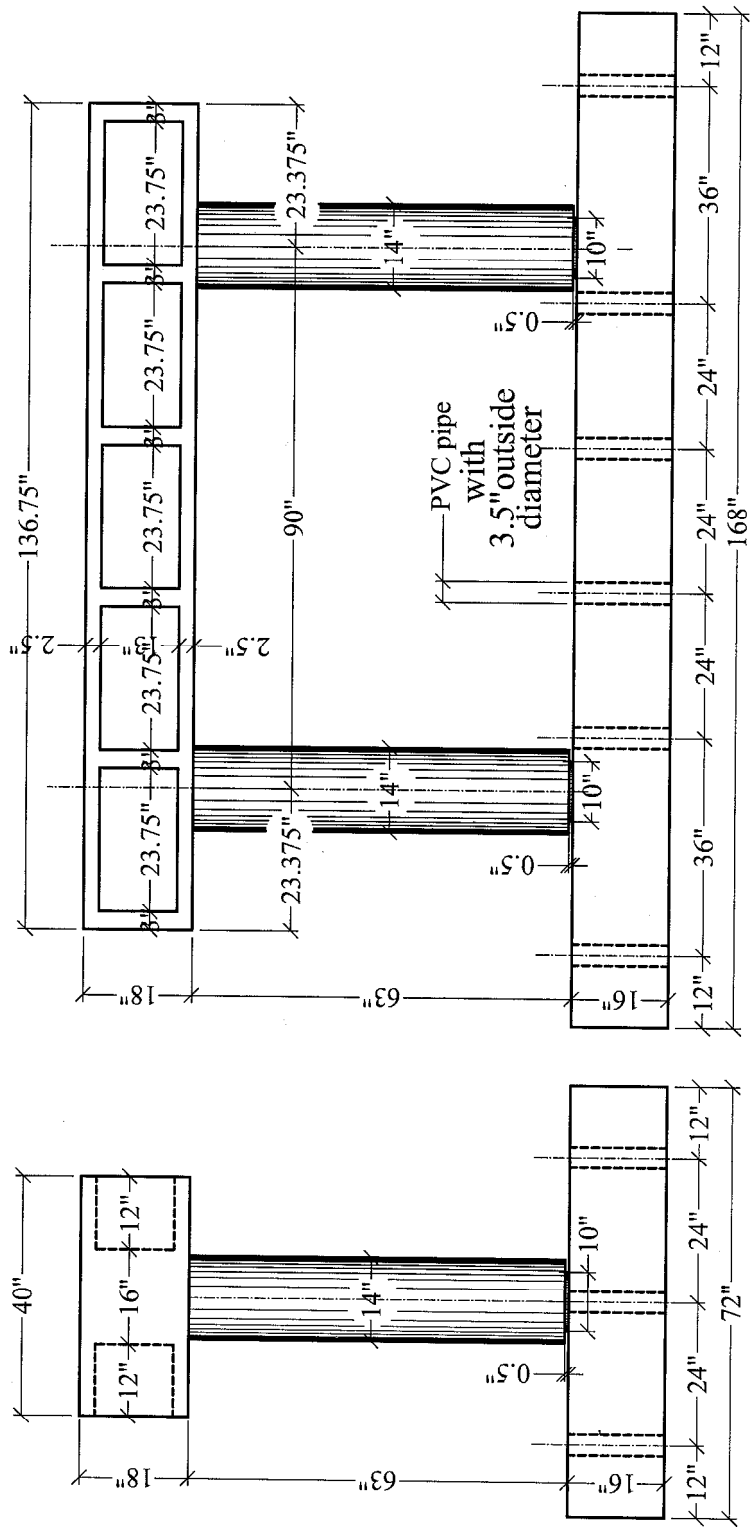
Concrete Dimensions of Specimen B2CM, (English Units)
